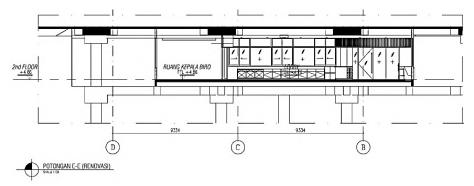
Section of the Marketing and Relations Departments Coworking Space (Source: author, 2024)
